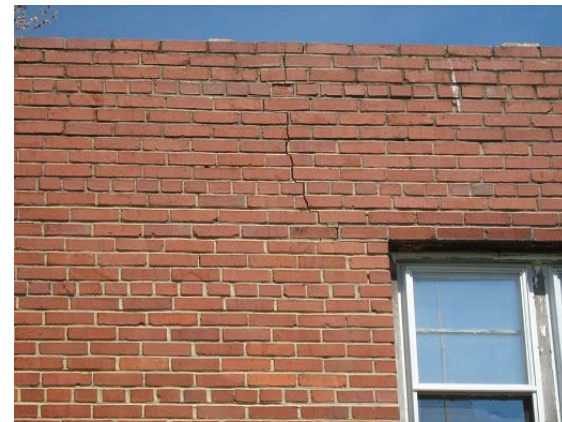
96: Apartment 1 - Cracks in Masonry Facade Due to Collapse
